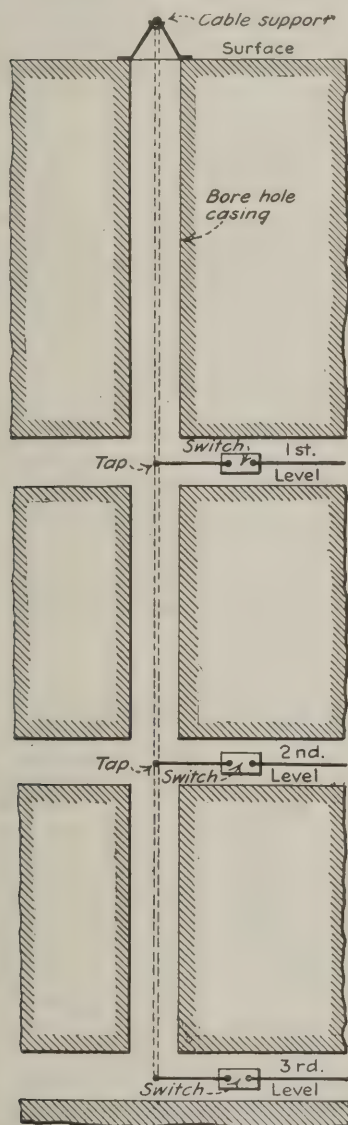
CONTINUOUS CABLE FROM SURFACE TO BOTTOM LEVEL
